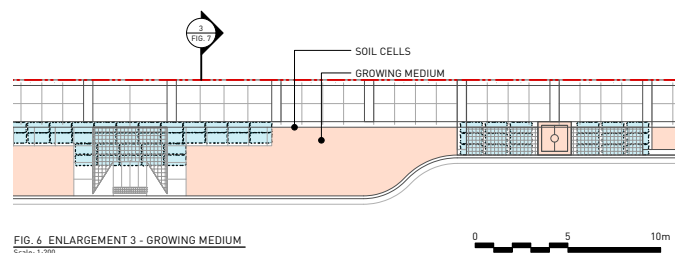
d) Typical plan view with soil cells creating continuous soil connections between planters underneath the boulevard and mid-block crossing space.
